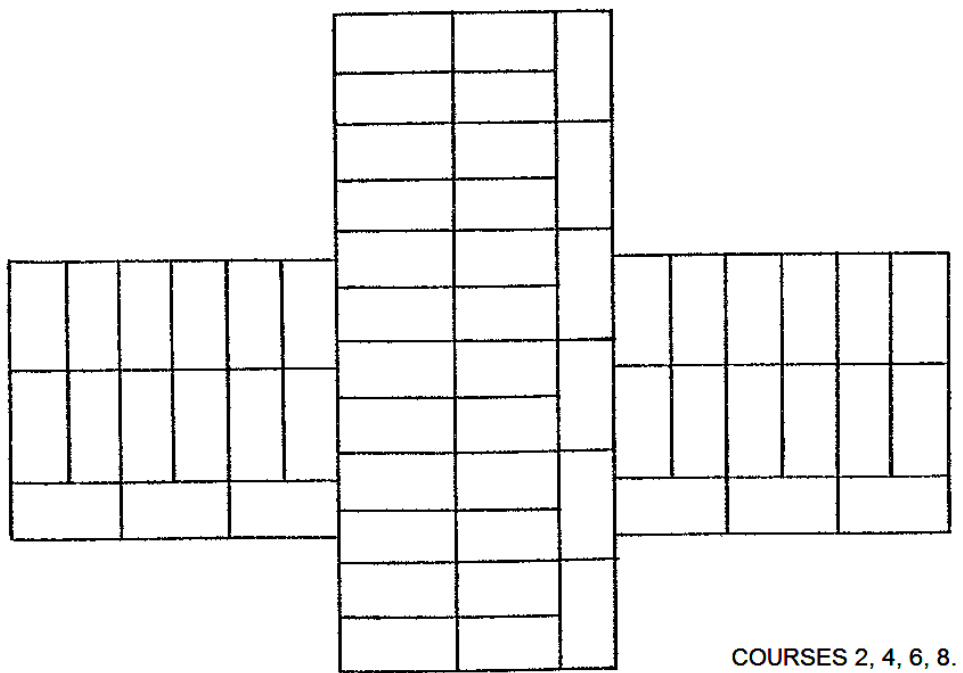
The alternate plan courses of a crossed intersection between two two-and-a-half brick walls
